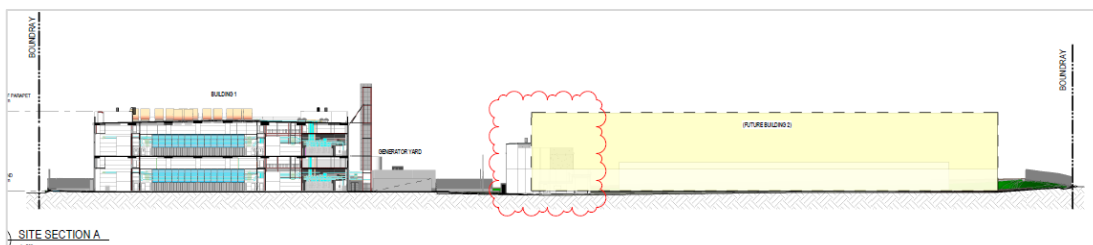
Elevation as proposed to be modified from Eastern Creek Drive
